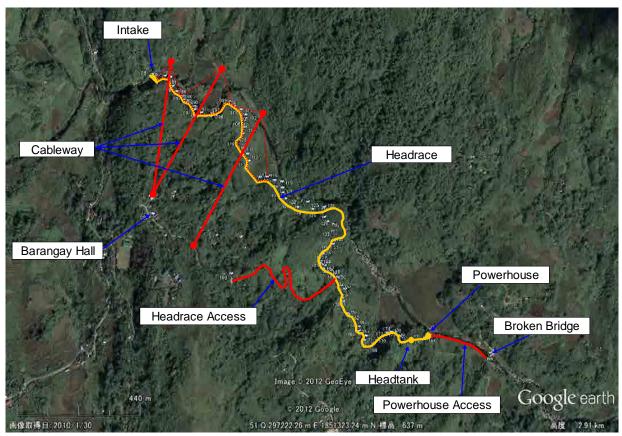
Conceptual View of the Temporary Installation Plan
